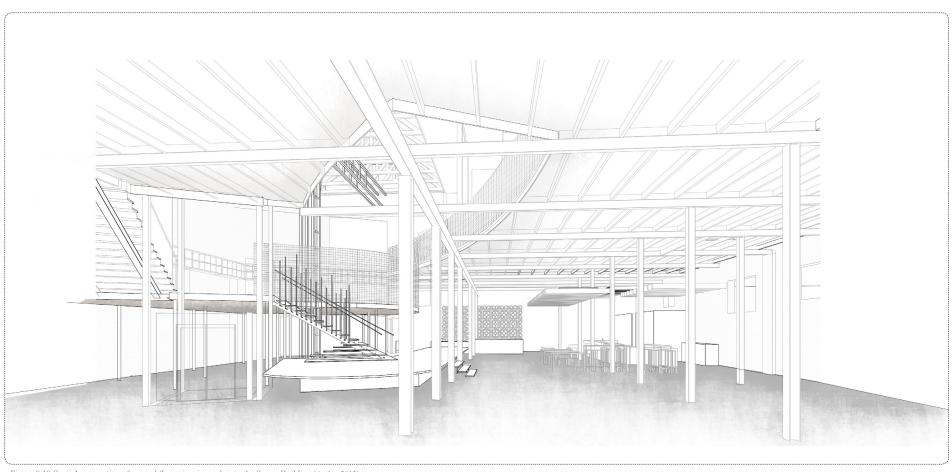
Spatial perspective of ground floor view inwards into the Saxon Building (Author 2013)
